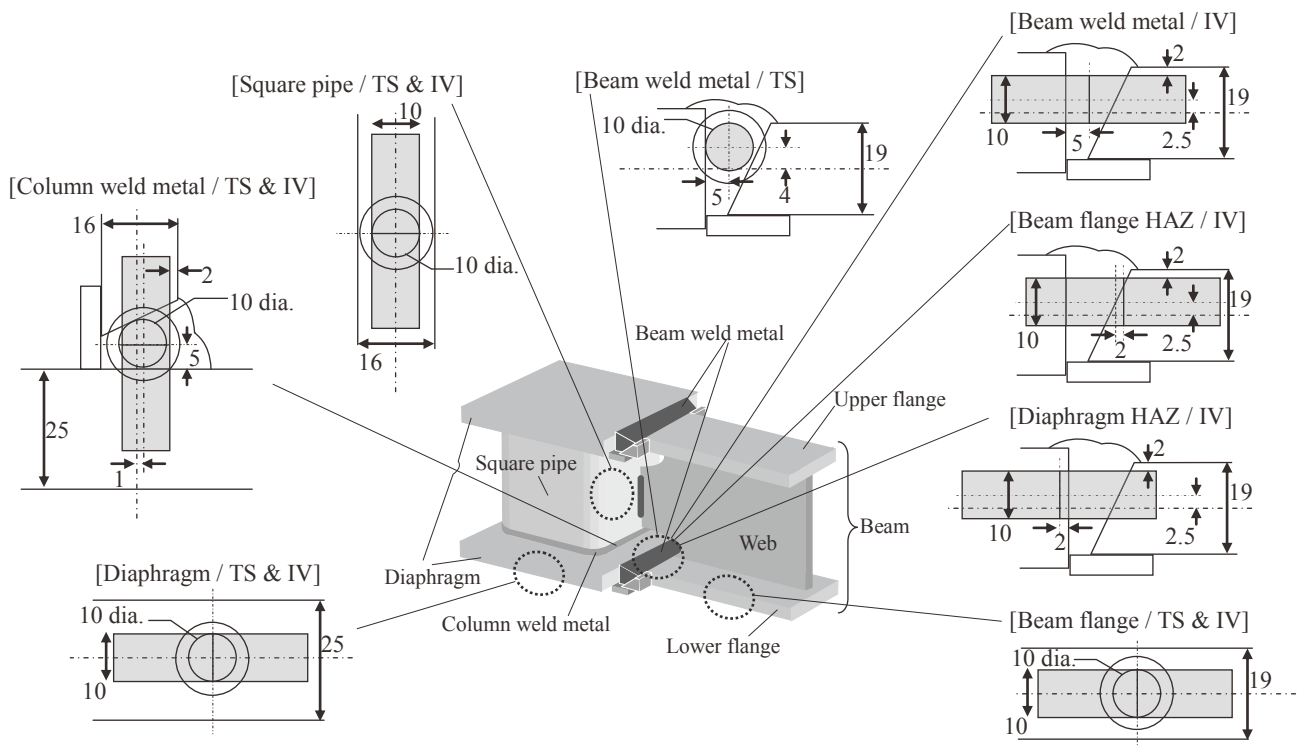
Position of mechanical test pieces about the base metals and weld metals
